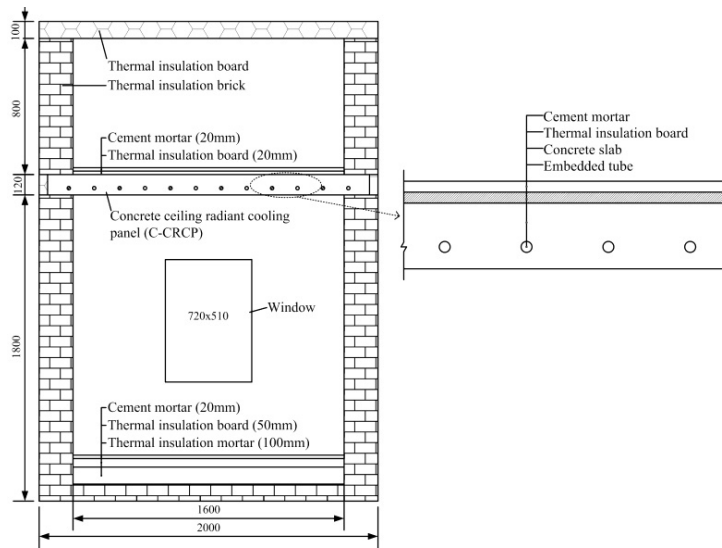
Elevation of the C-CRCP chamber (Unit: mm).
